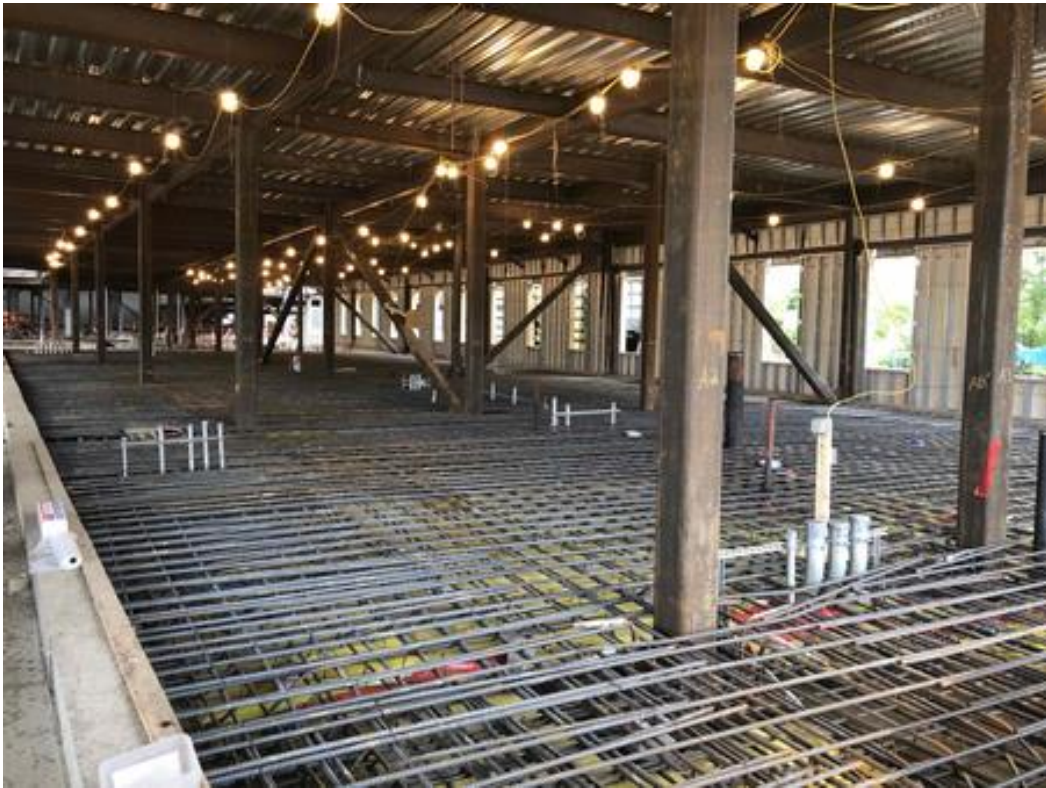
Area A Slab on Grade Rebar Installed to Receive Pour.
